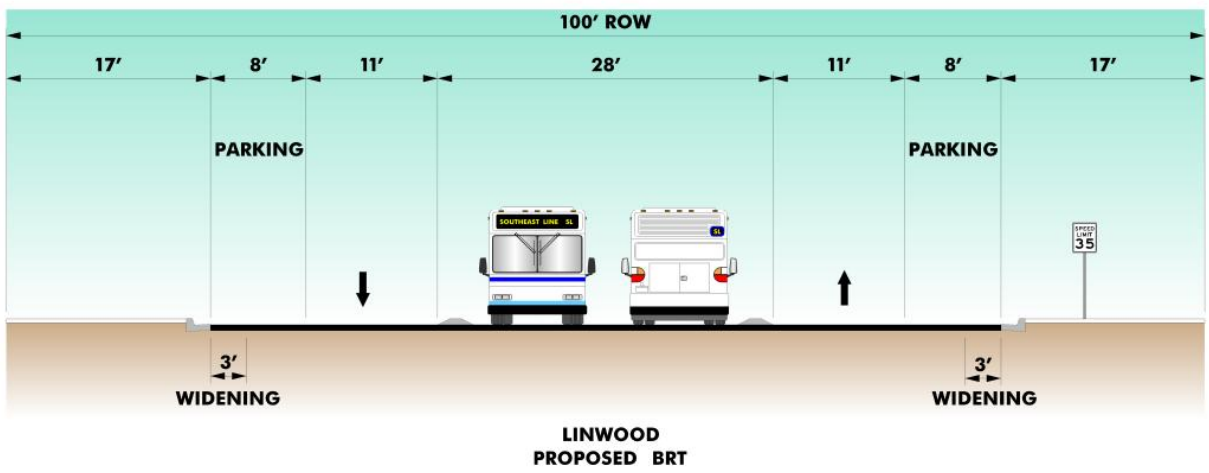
Bus Rapid Transit Linwood Blvd Typical Section
